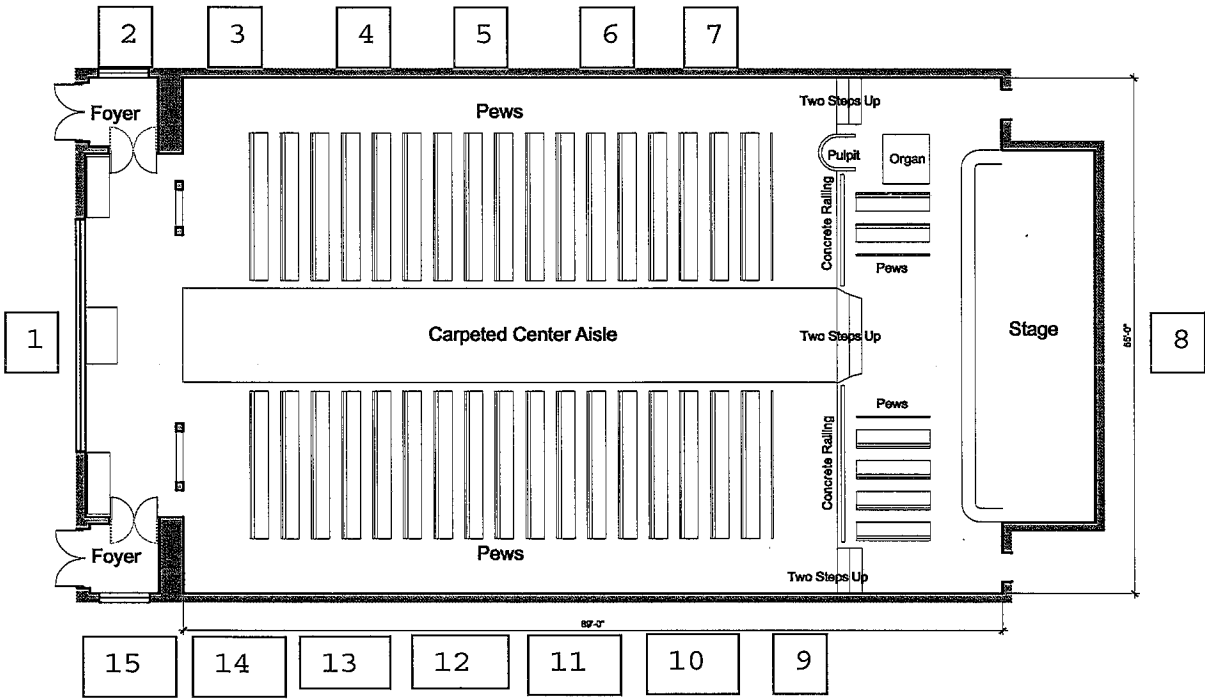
Floor Plan of Christ Church and Windows (Numbers refer to Stain Glass Windows pictured below)
